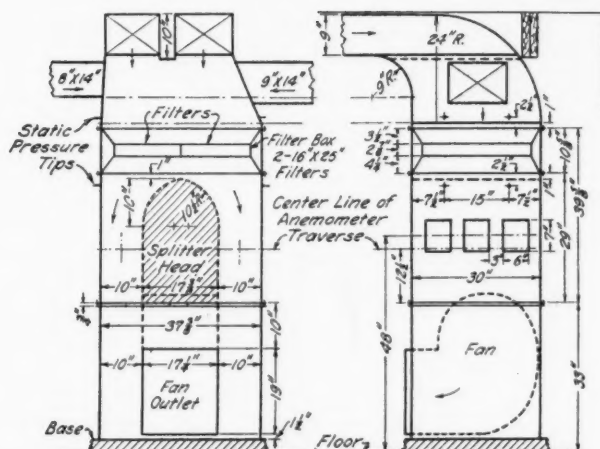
Details of the cold air return and fan housing for the forced air system; showing single outlet fan.
